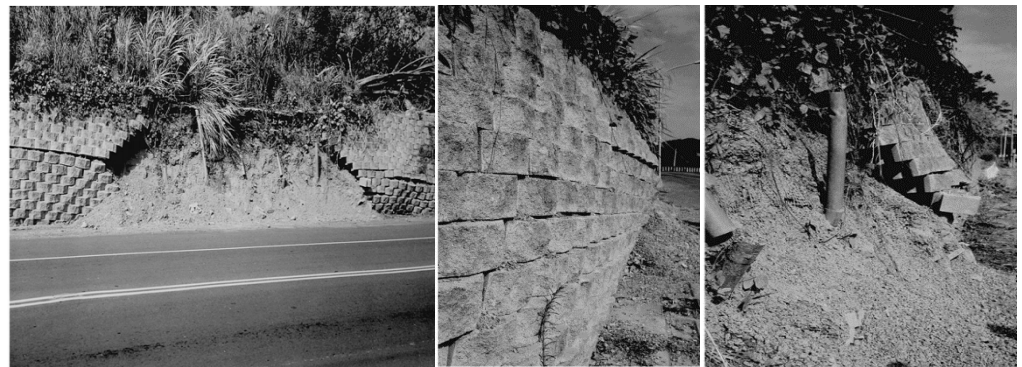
Failure case of reinforced soil retaining walls under earthquake action [8].
